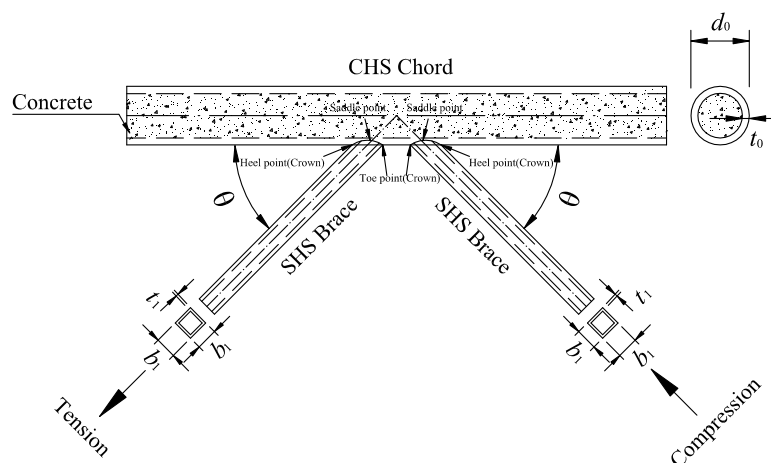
shows the dimensions and parameter definitions of hollow and concrete-filled circular chord and square braces K-joints specimen. The test specimens were fabricated from the circular hollow section steel tube of chord and square hollow section steel tubes of brace. The chord of one specimen was fully filled with self-compact concrete along the full length. As specified in CIDECT Design Guide No. 8 (Zhao *et al.* 2001), the specimens of K-joints were designed with non eccentricity in the range of allowable error. The geometric size and numbers of the two full scale circular chord and square braces K-joints are shown in Table 1.
